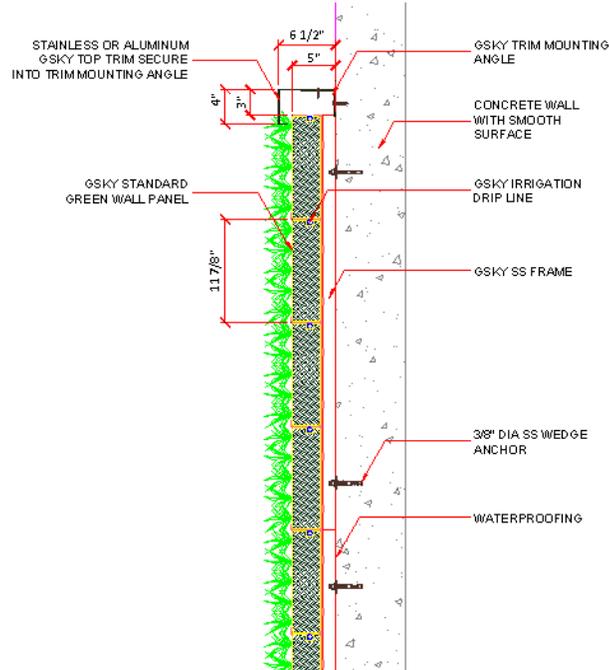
Green walls section. (GSKY Green Wall Panels, 2010).
